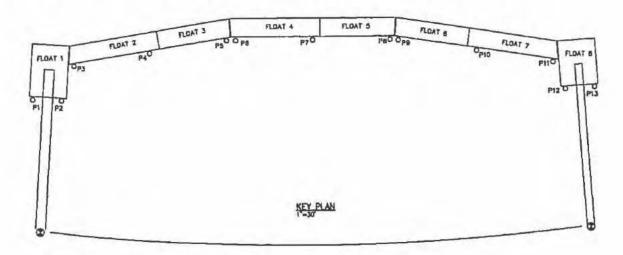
General arrangement plan view of Harbour Green Public Dock
